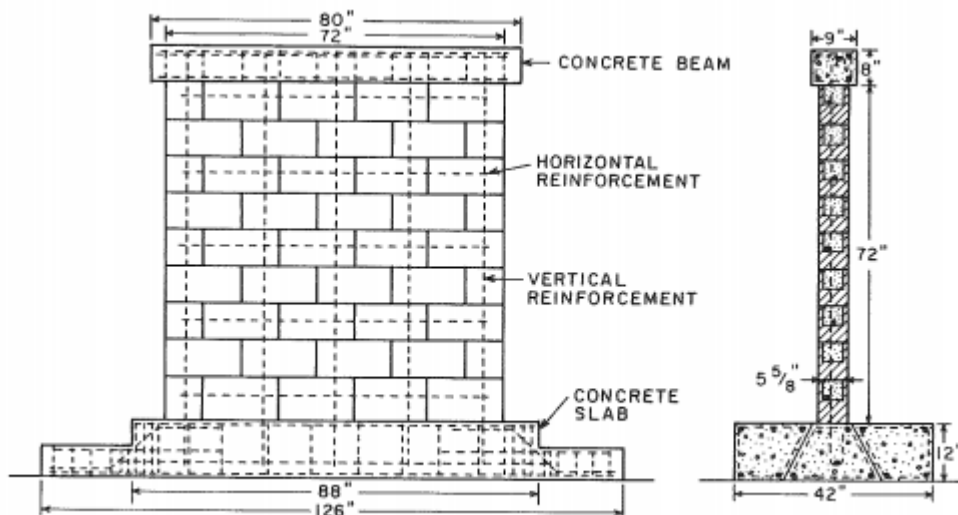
Reinforced masonry wall Sp. 5 tested by Shing et al. (1991)
